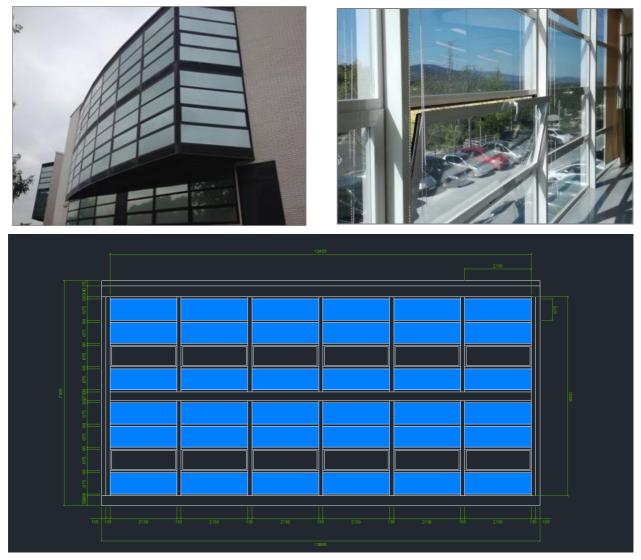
SE curtain wall, openable windows and planned layout of the PV solar field.
